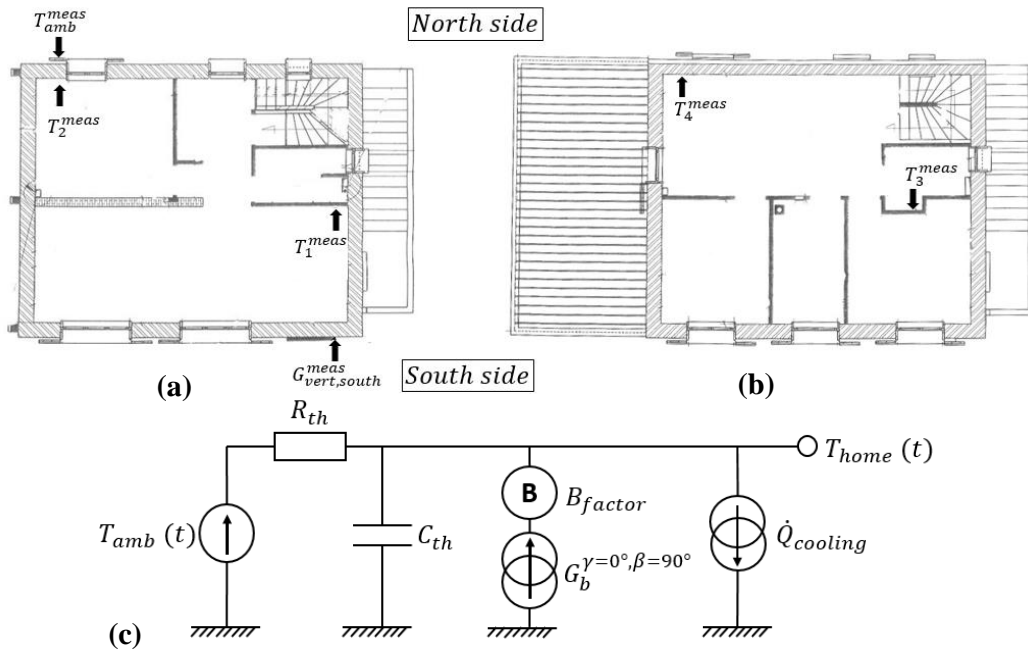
Studied single-family house. (a) Ground floor and (b) first floor plans, and (c) 1R1C thermal model considering the cooling power and irradiance on the south face.
